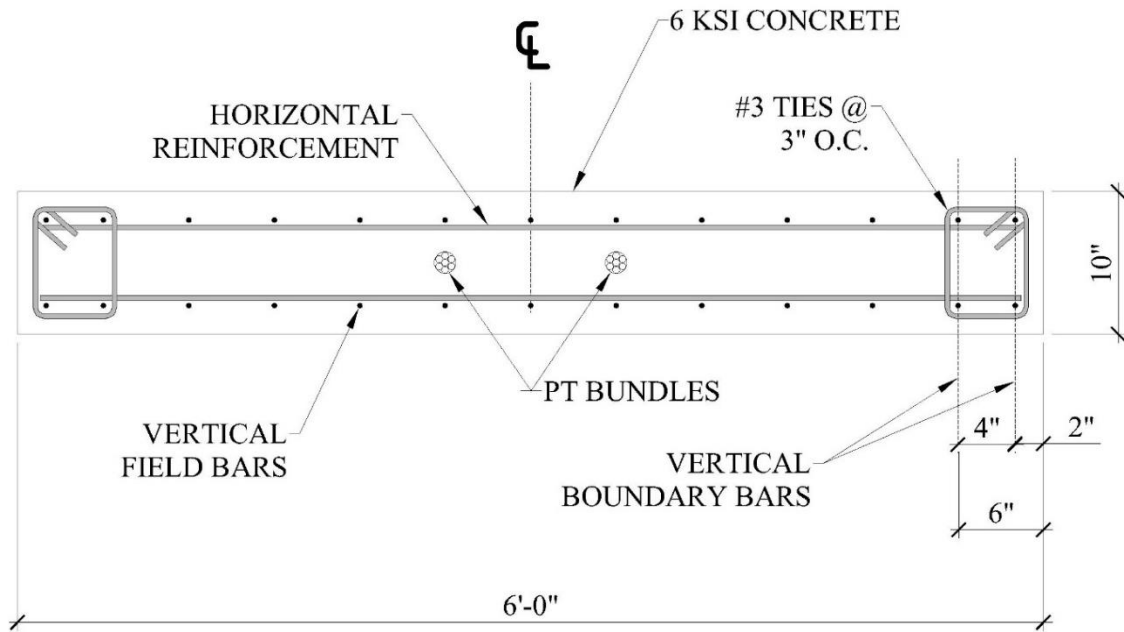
Typical cross section of studied walls (adapted from Tipping Mar 2011)
